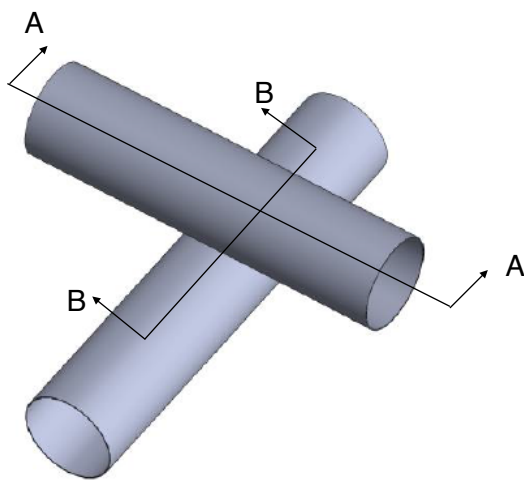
(a) diagram of a new tunnel construction under an existing tunnel
